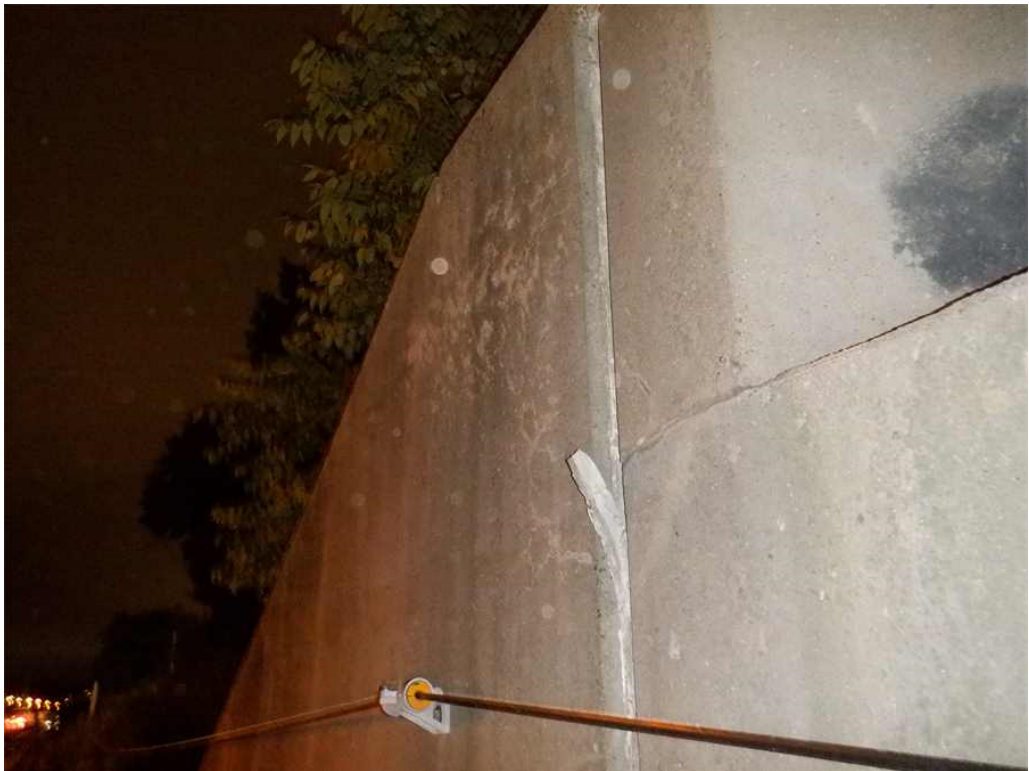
West wingwall, at the north abutment - the joint filler is missing at the top.
